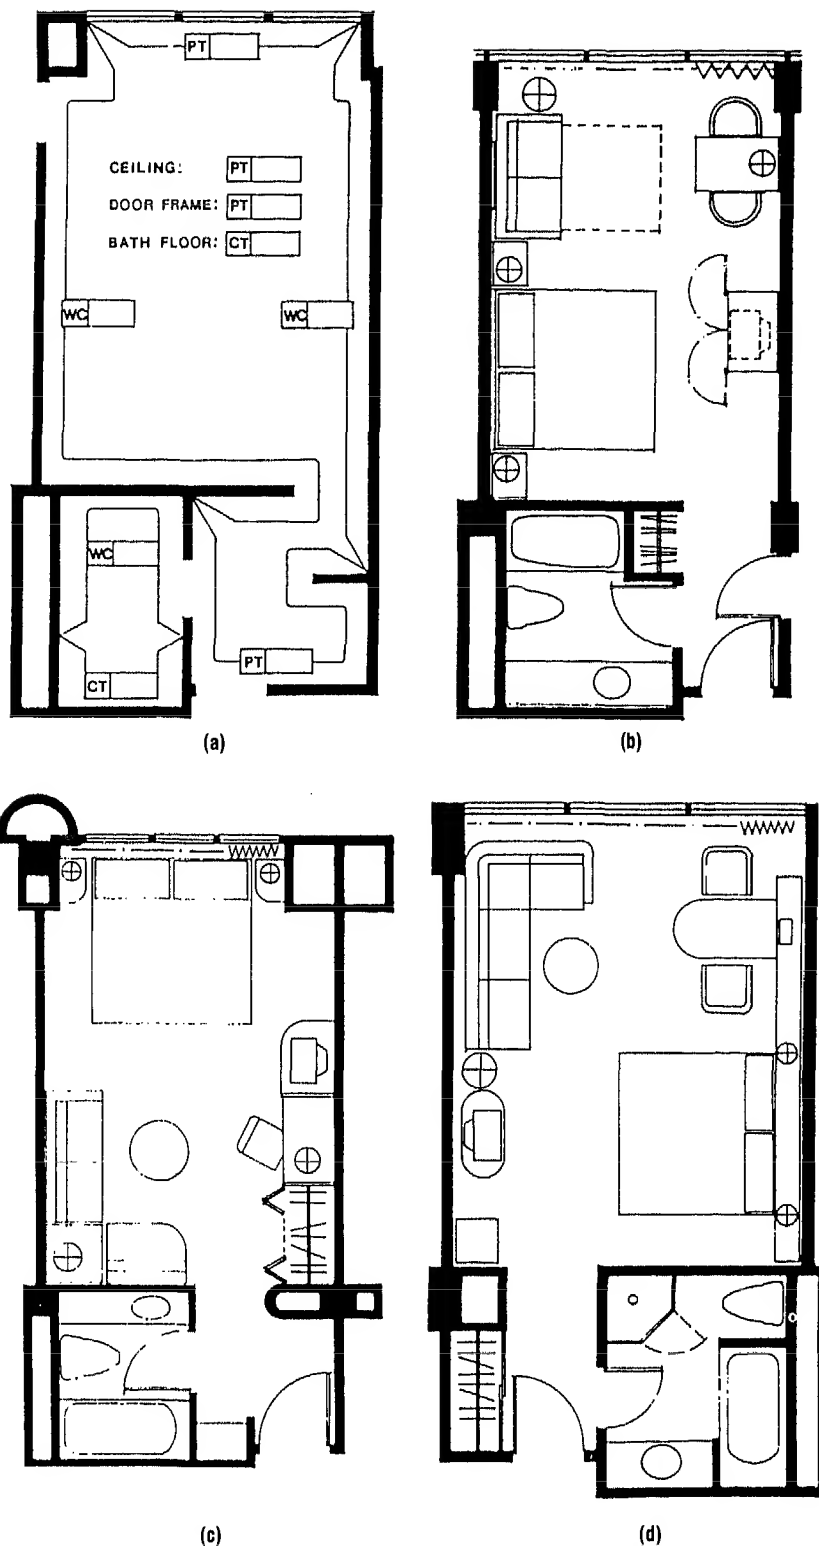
Guestroom plans. (a) Typical double-double finishes plan: vinyl wallcovering (WC), paint (P), carpet (C), ceramic tile (CT) identified and keyed to legend. (b) King-studio (Holiday Inn): standard layout with armoire unit and large lounge area including a convertible sofa. (c) Reversed layout (Sheraton, Washington, D.C.): unusual room with bed placed in front of window and lounge area near bathroom. (d) Luxury king room (Sheraton Grande, Los Angeles): oversized room with shelf/ledge in place of headboard, large desk surface, and lounge area; four-fixture bathroom.
